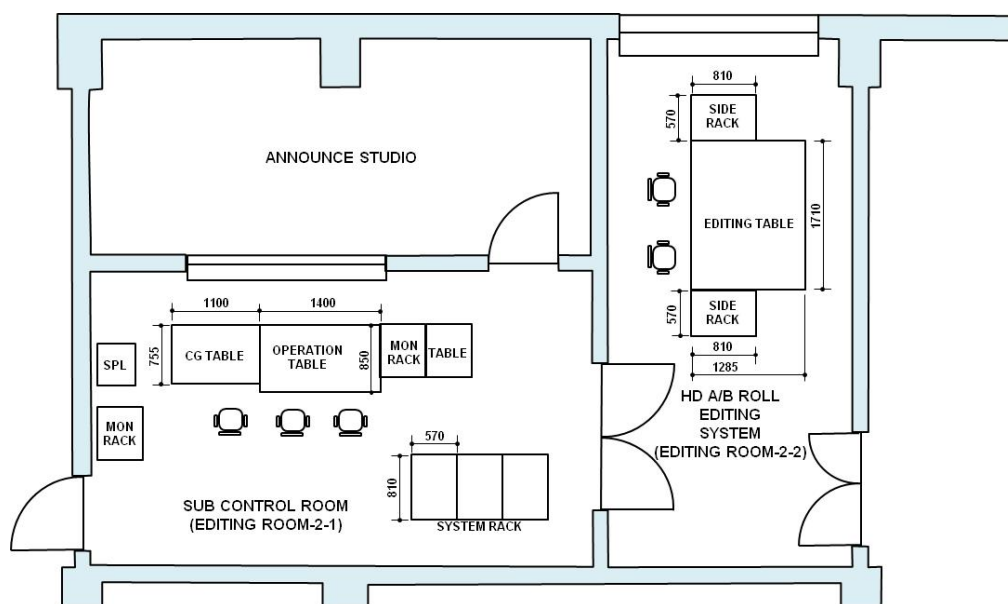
Equipment Arrangement of Editing Room-2-1 and Editing Room-2-2
